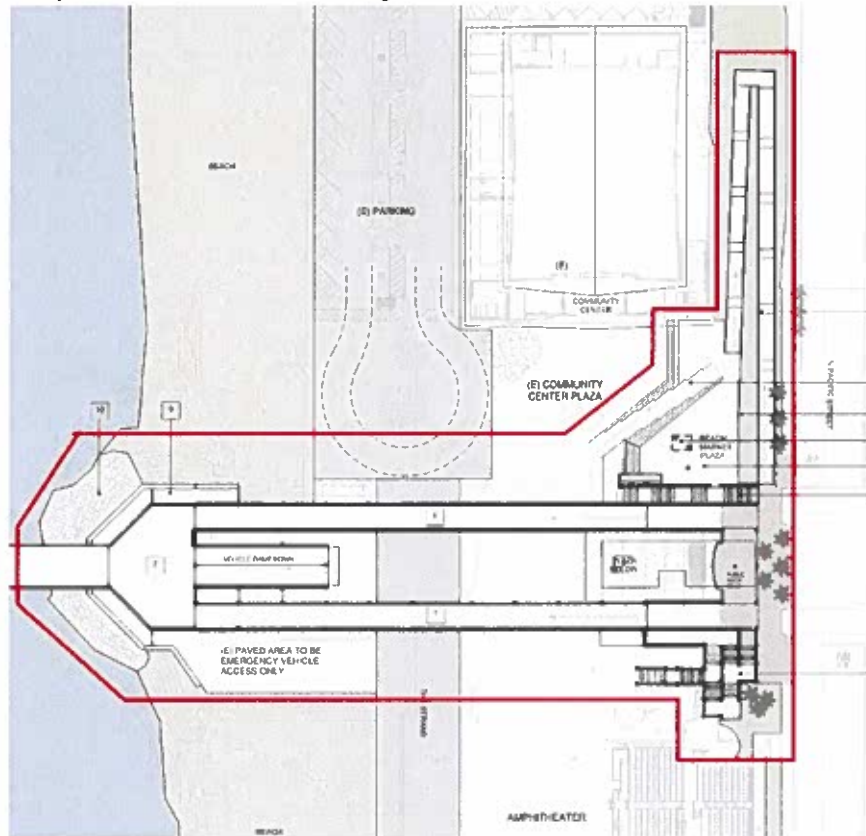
Design Limits for Pier View Way Bridge and Lifeguard Headquarters
